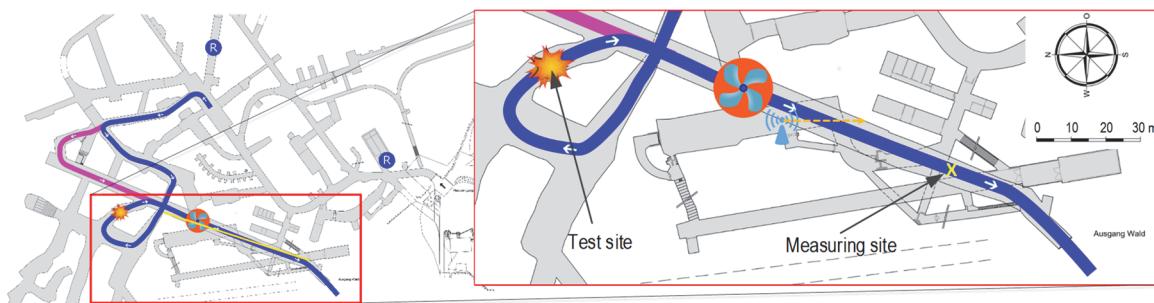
Layout of the test area: test site (fire), main ventilation section (blue) with closed bypass (pink), fan and measuring site (yellow)
